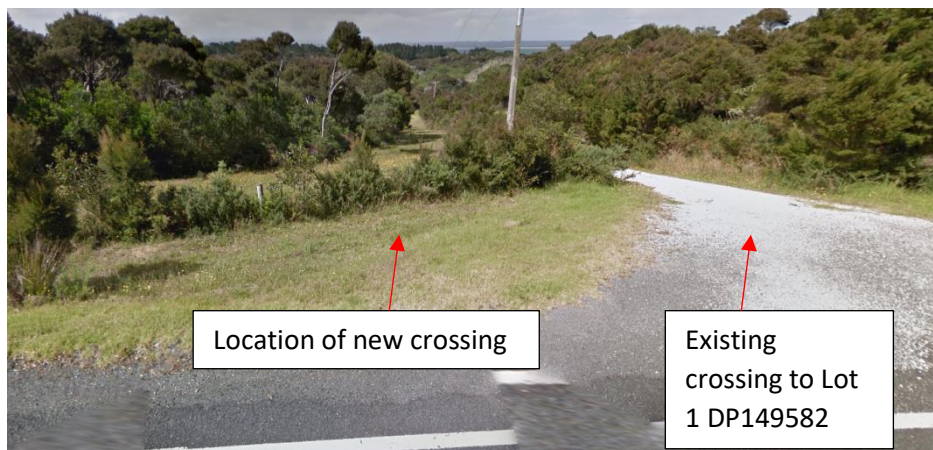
Image showing the proposed crossing location to Proposed Lot 2.
